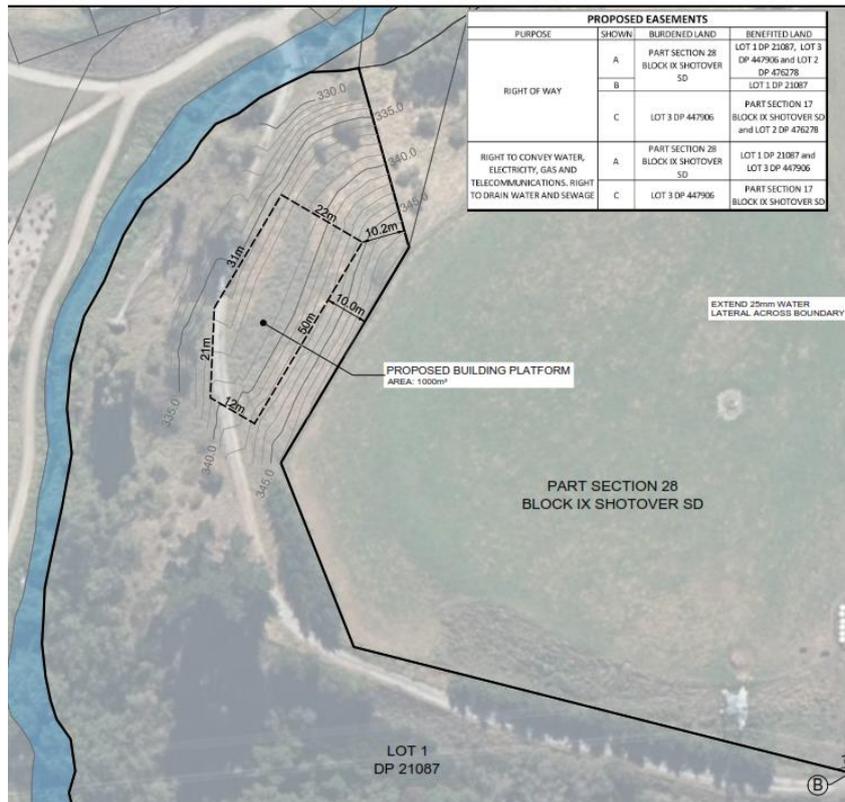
Site location 'Proposed Lot 1' and proposed building platform
